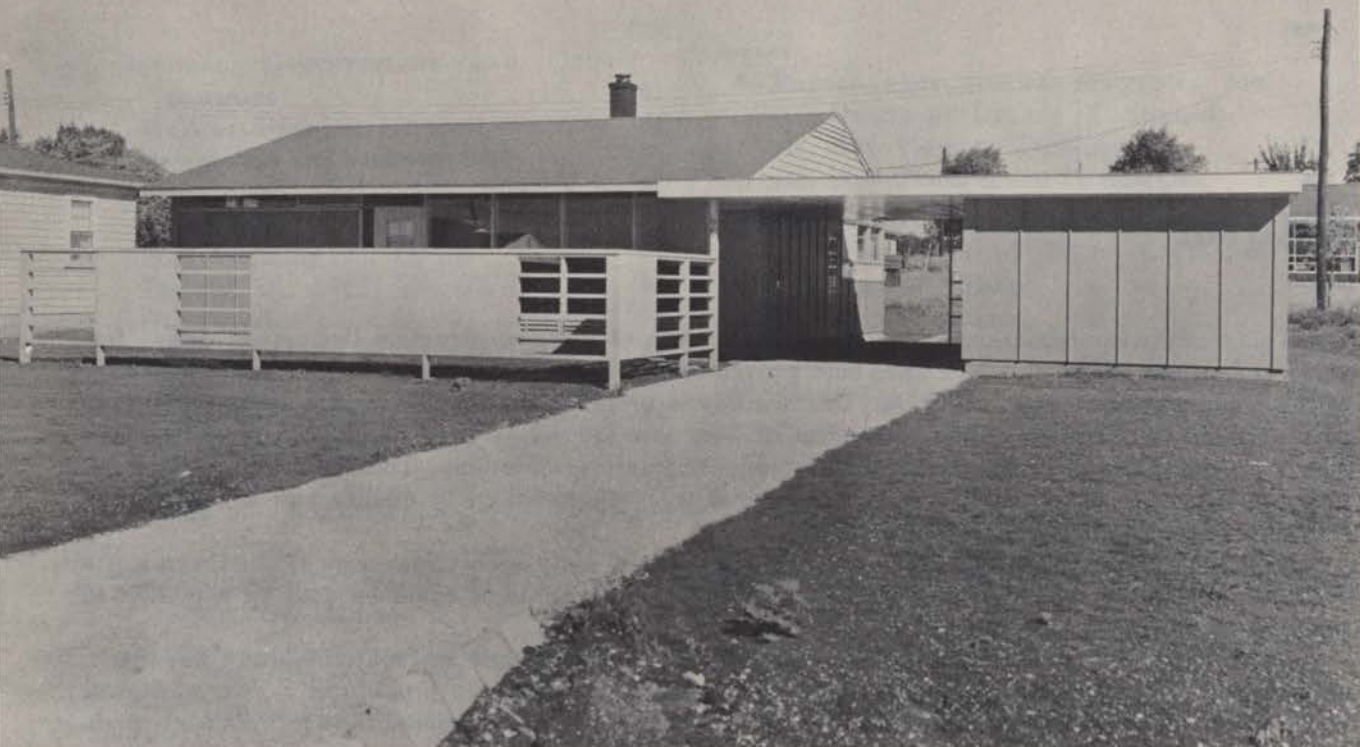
HOUSE A—Constructed on a lot 70 feet by 132 feet, located on the north side of an east-west street. The indoor-outdoor living area is on the south or street side of the house. This house was constructed as the first house in the project.
